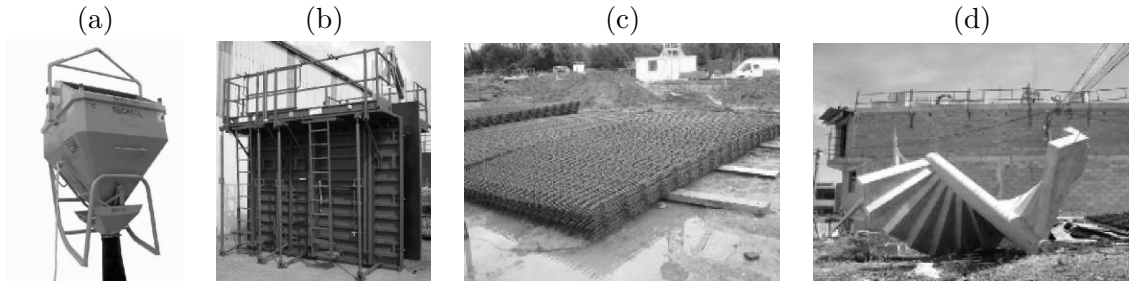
Examples of loads hoisted by the crane on the construction site: (a) Concrete bucket, (b) Forms, (c) Steel frameworks and (d) Prefab stairs.
